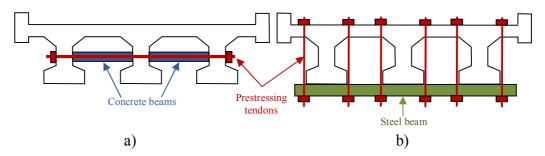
Sketch of a transversal reinforcement with a) concrete beams b) steel beams
